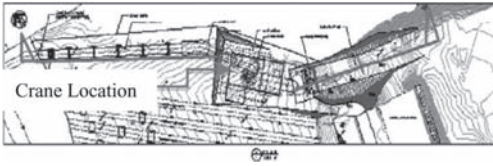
General layout plan of the planned extension (SMEC, 2011).
